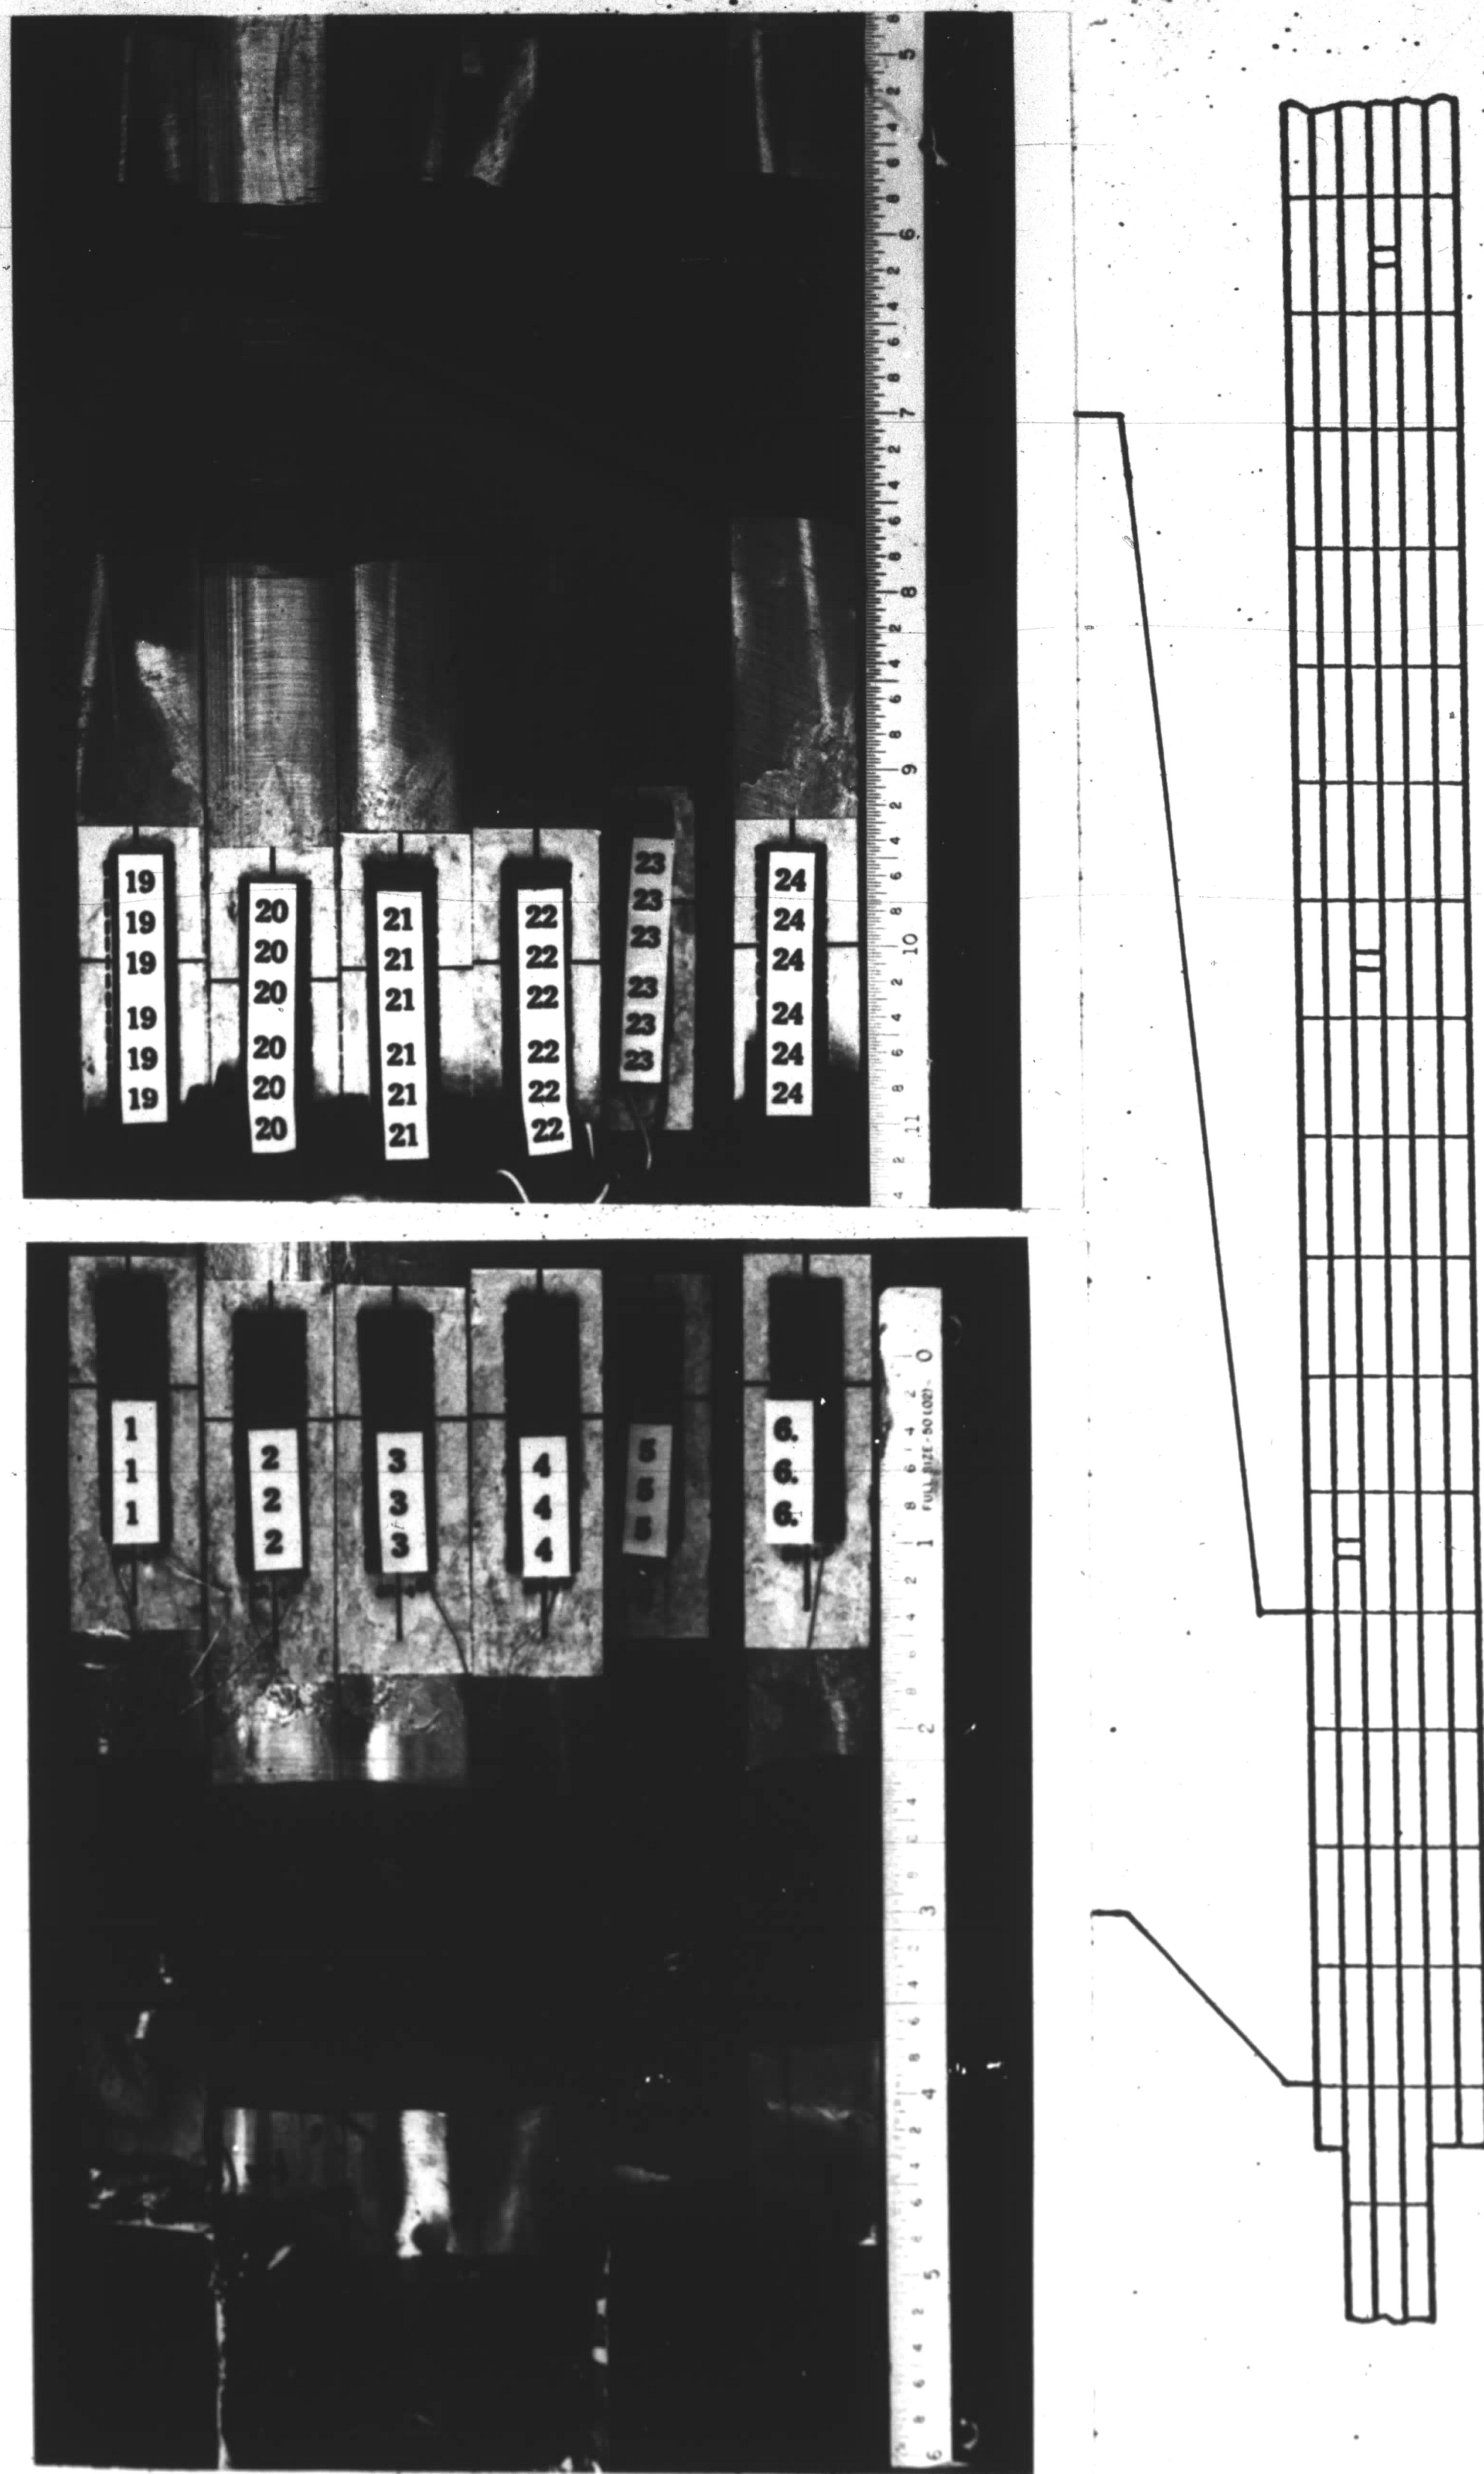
SCRIBE LINES AFTER FAILURE IN MODIFIED BOLTED JOINT
